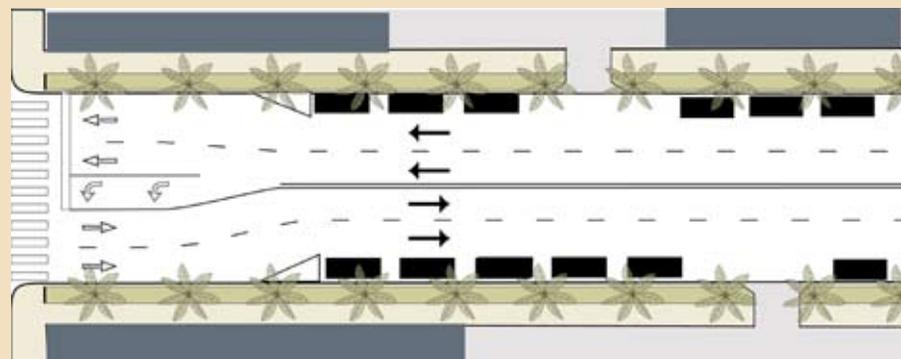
Continued Transition to Town Center – Fewer Driveways, More On-Street Parking
